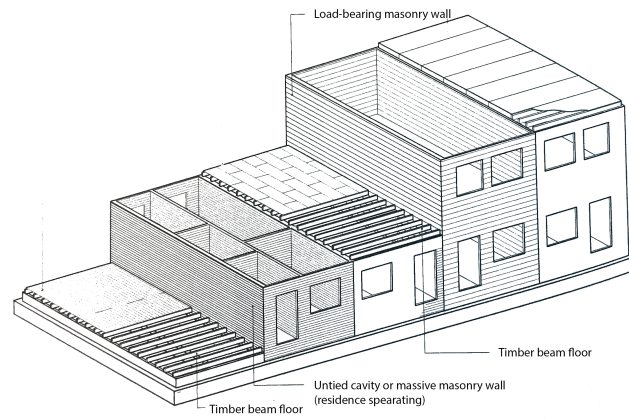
Traditionally built residences with masonry cavity walls and timber floors
